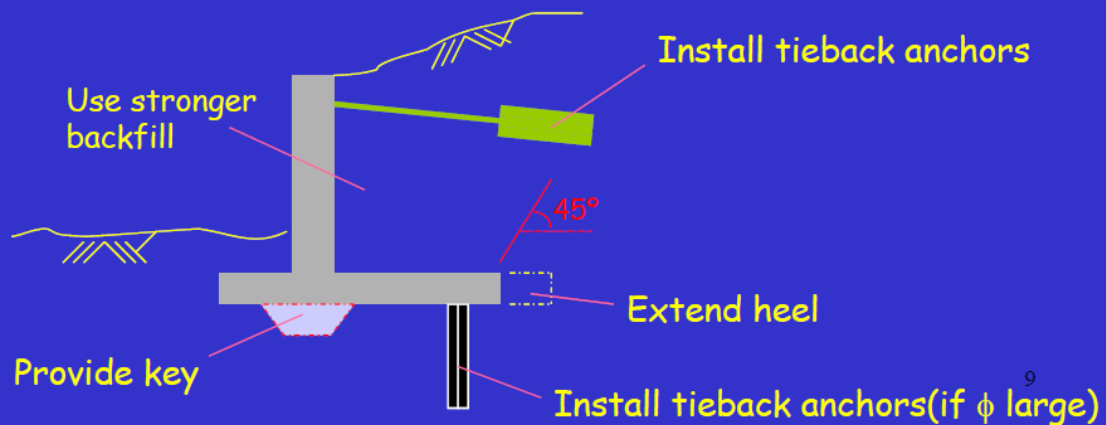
Remedial Measures against Base Sliding of a Cantilever Retaining Wall (from lecture note)
